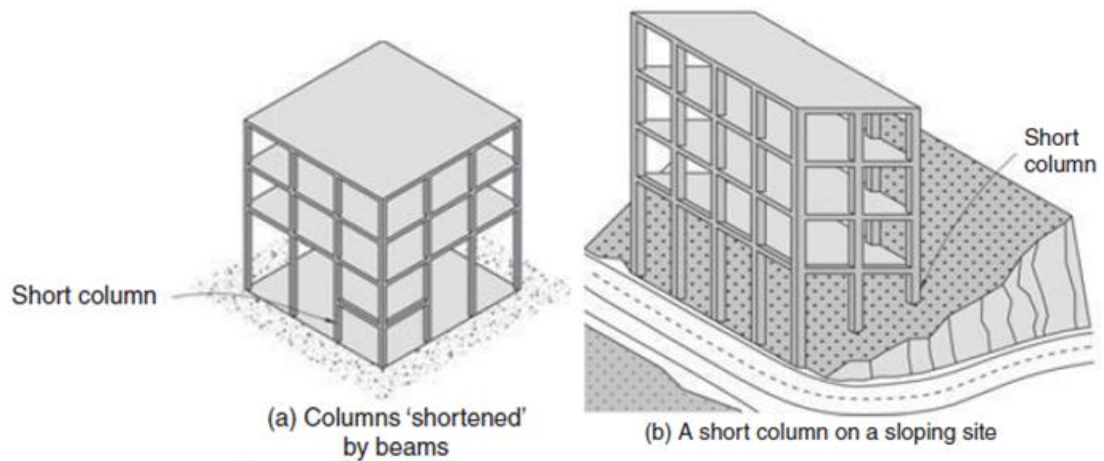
Examples of Short Columns Among Longer Columns (Charleston, 2008)
